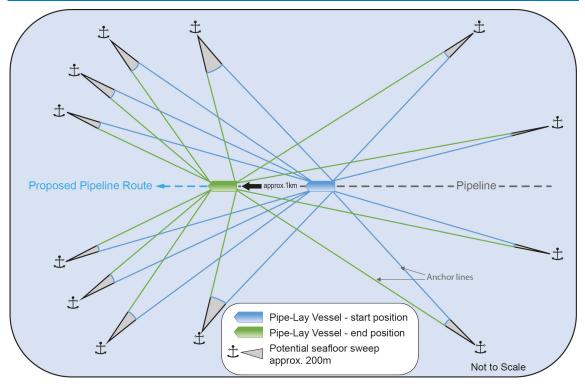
Typical Pipe-Lay Vessel Anchor Spread
